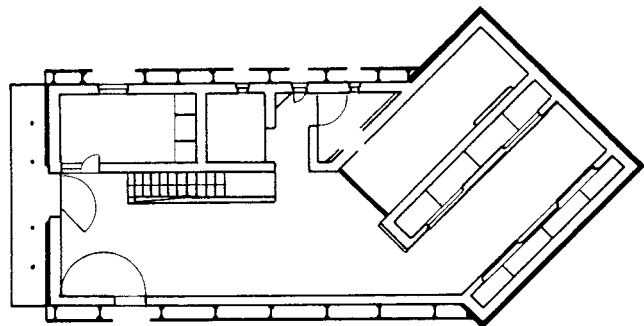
Plan of the Jinchokan Shiriyokan, showing the separation of skin and structure.
